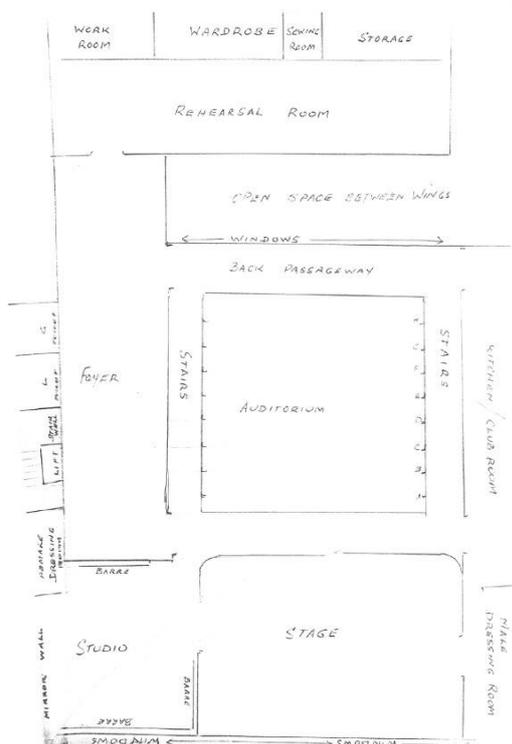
Patch Theatre floor plan at Munster House. Source: Hazel Dawson, [Bird-Eye View Sketch of Patch Theatre Layout at Munster House], illustration, Patch Theatre Archives.
